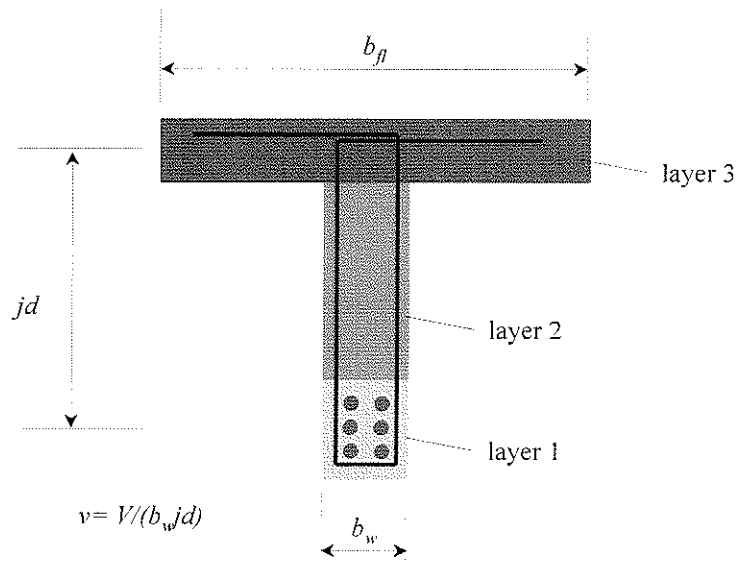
Modelling of the beam section as three concrete layers for the MCFT
